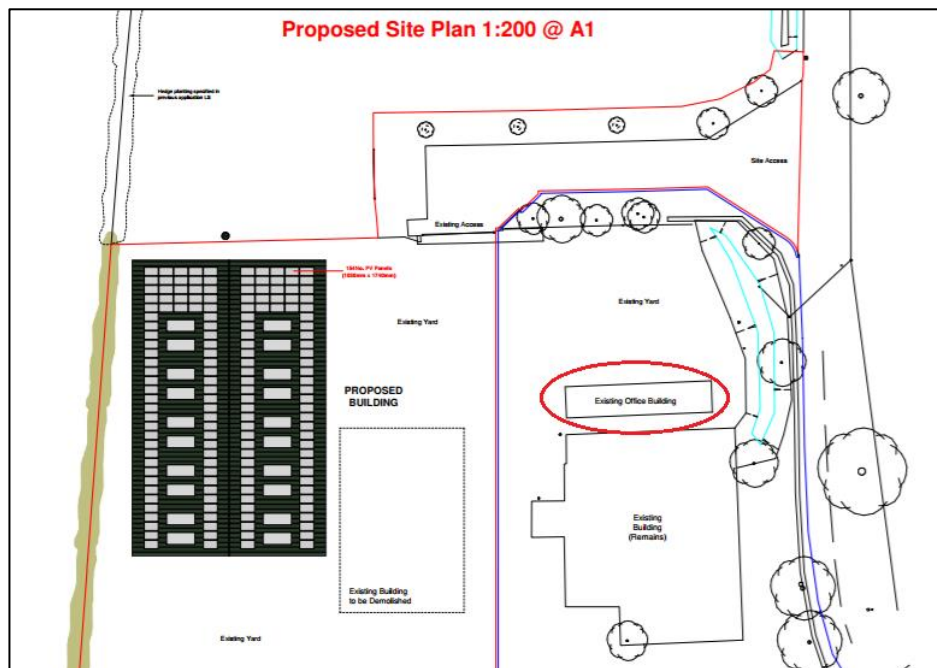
Site Plan (DC/21/06007 - Block Plan - Proposed TL-4539-21-13A)
